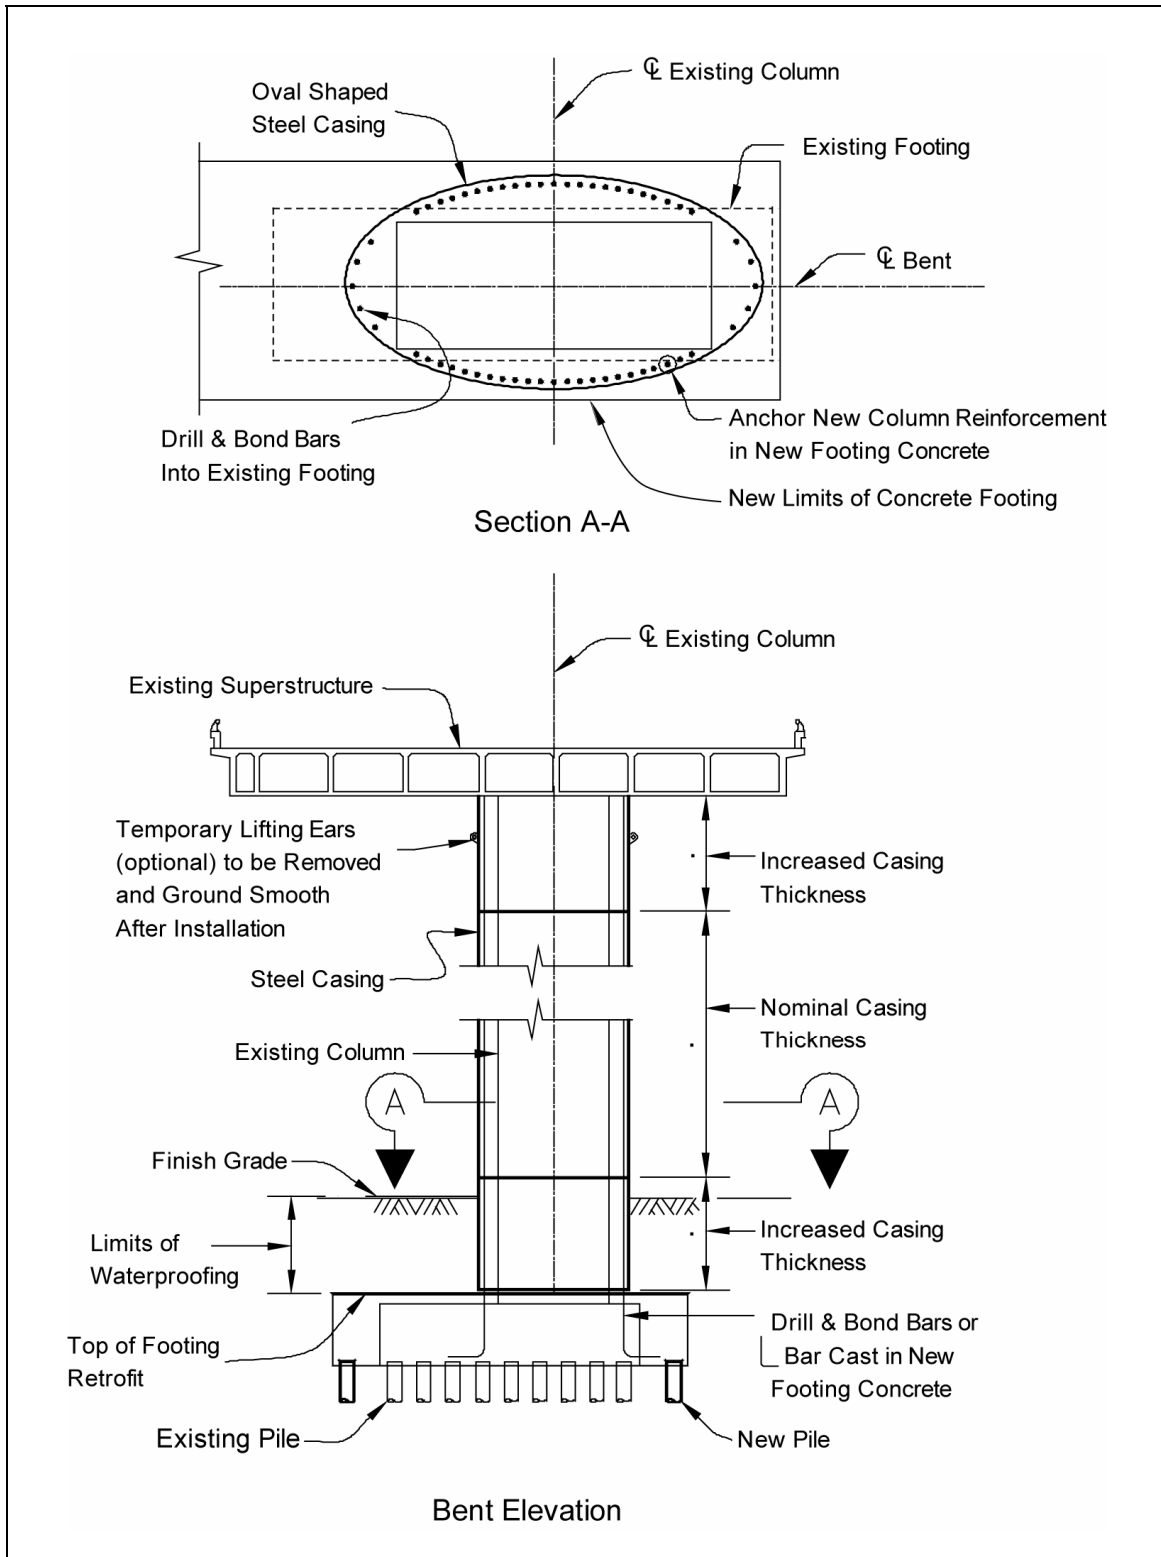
Column strengthening by adding reinforcement within steel shell.
